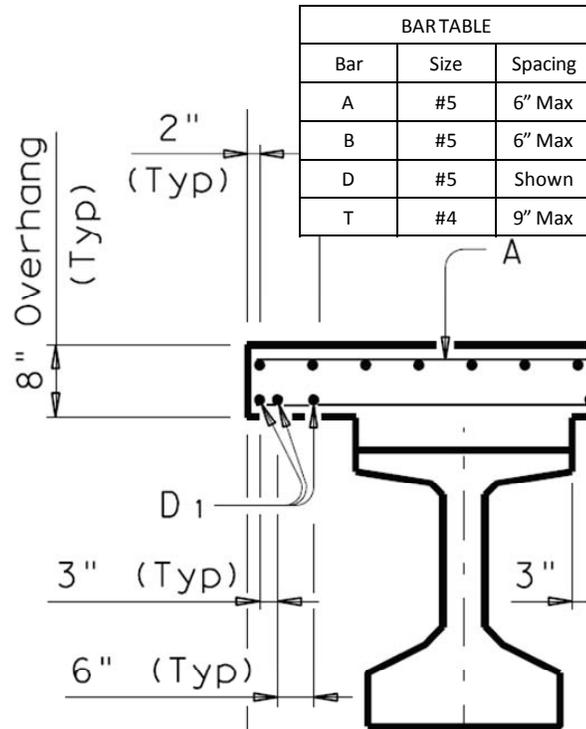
Typical TxDOT details for bridge deck overhang (TxDOT SIG Detail, 2007)
